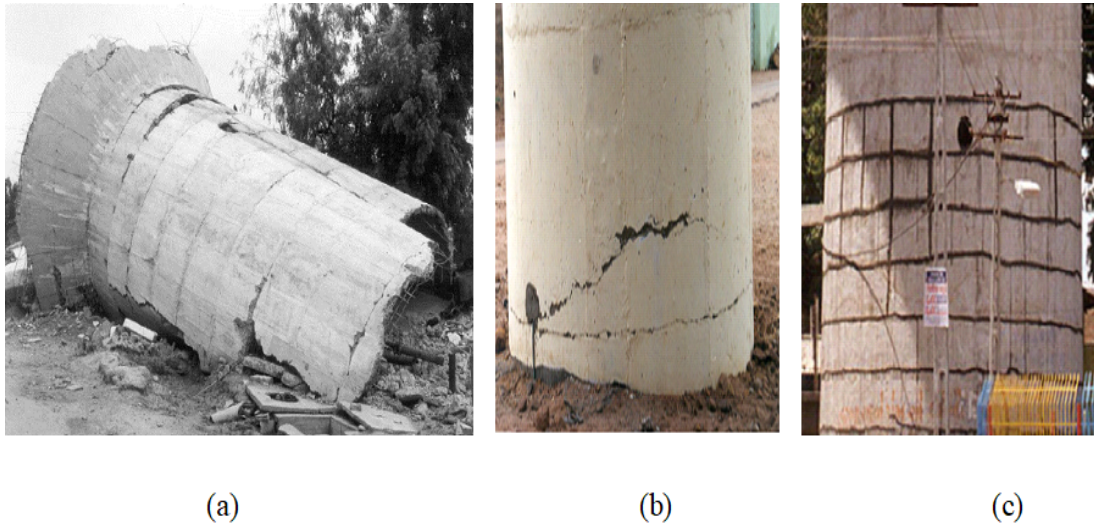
Damages of Elevated Water Tank, (a) Shaft Supported EWT Collapsed Pattern [5], (b) Diagonal Circumferential and Horizontal Cracks In Shaft [7], (c) Vertical Cracks in Shaft [7].
